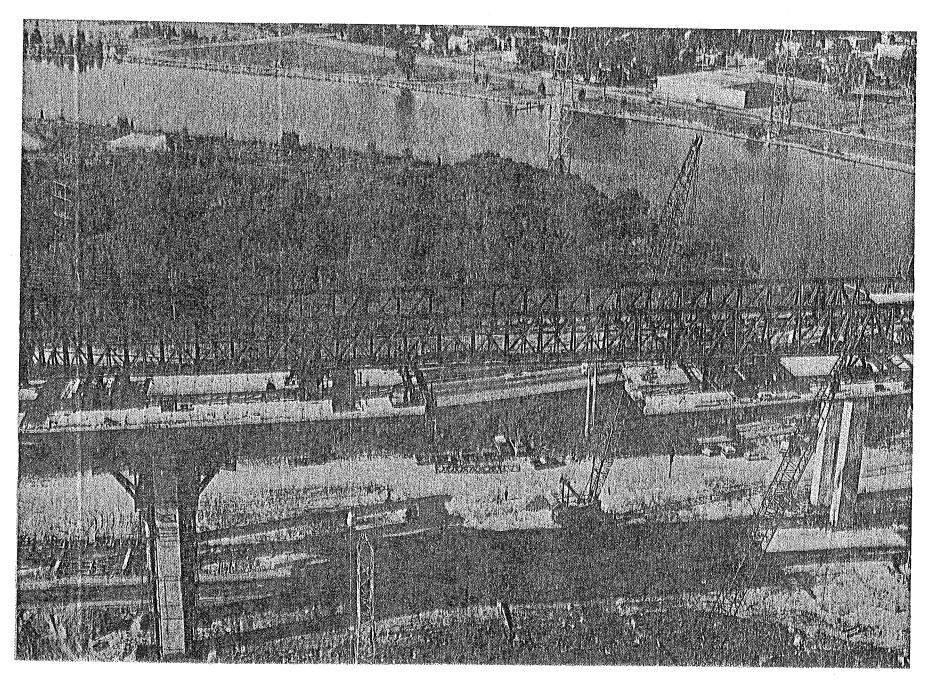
Aerial view of Launching Girder at Piers 10N and 11N
